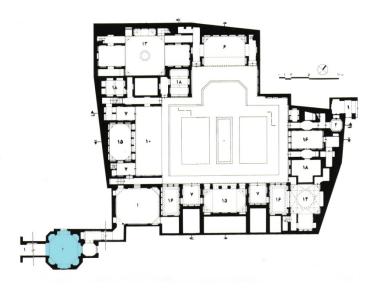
Kashan, Abbasian mansion, Ground floor plan
